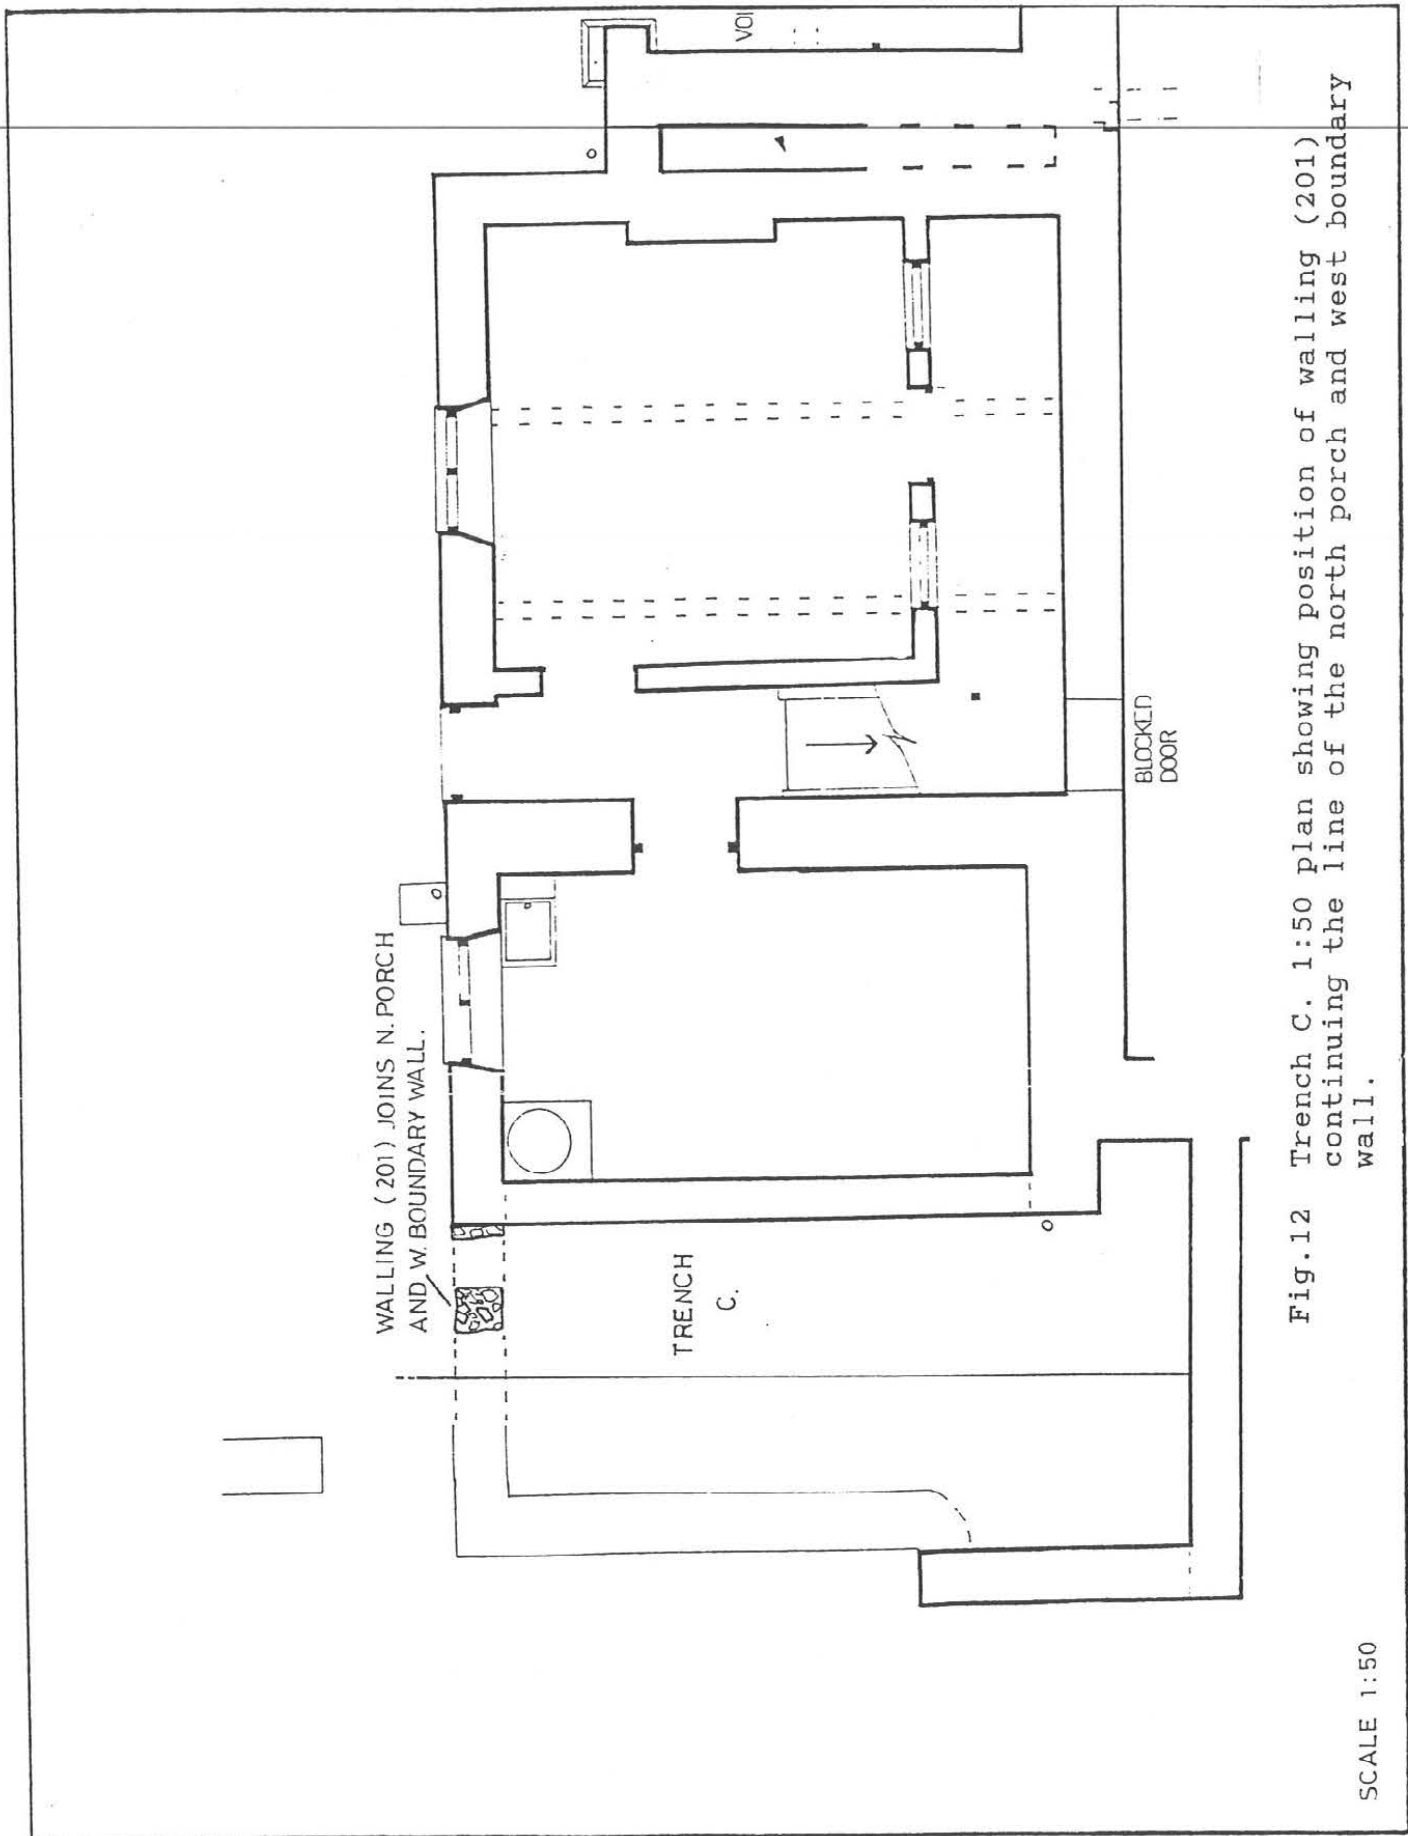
Trench C. 1:50 plan showing position of walling (201) continuing the line of the north porch and west boundary wall.
